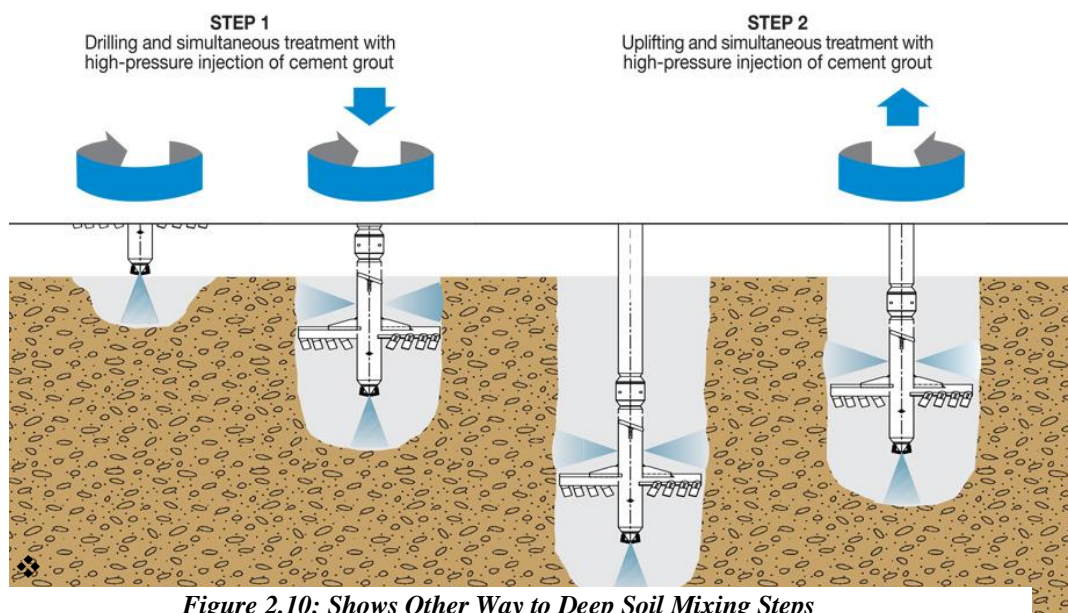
Shows Other Way to Deep Soil Mixing Steps
